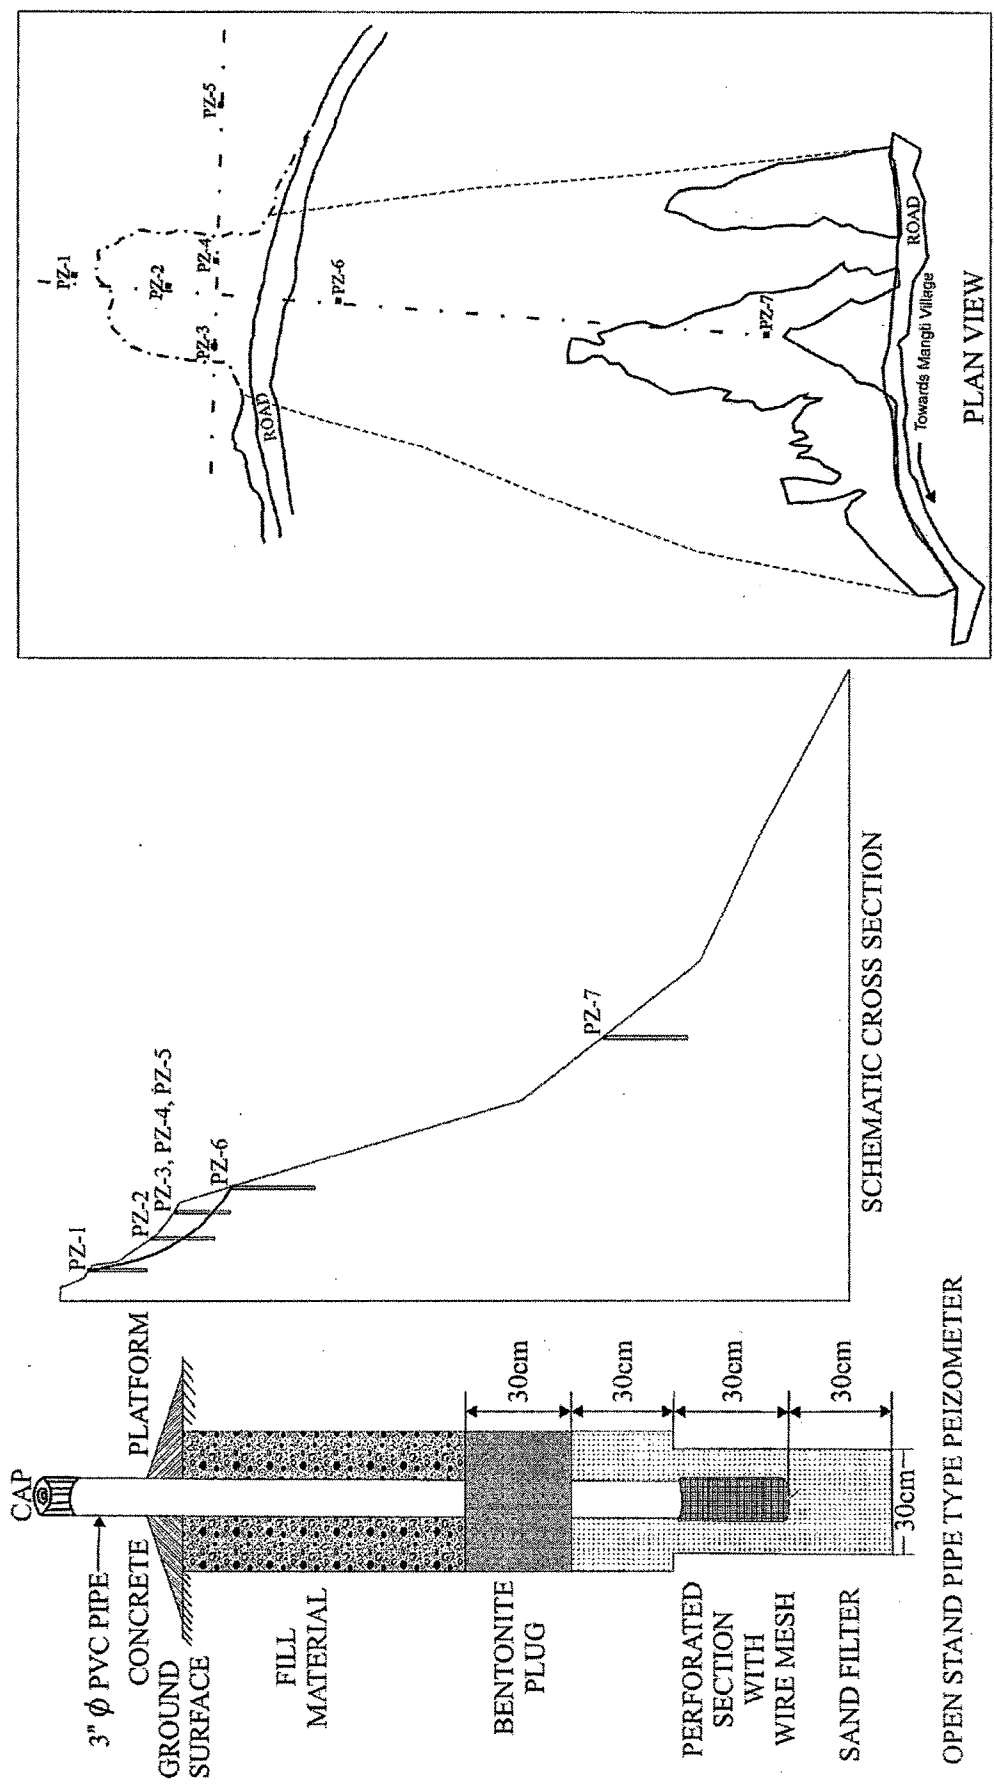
Location Plan of Installed Open Stand Pipe Type Piezometers – Mangti Landslide
